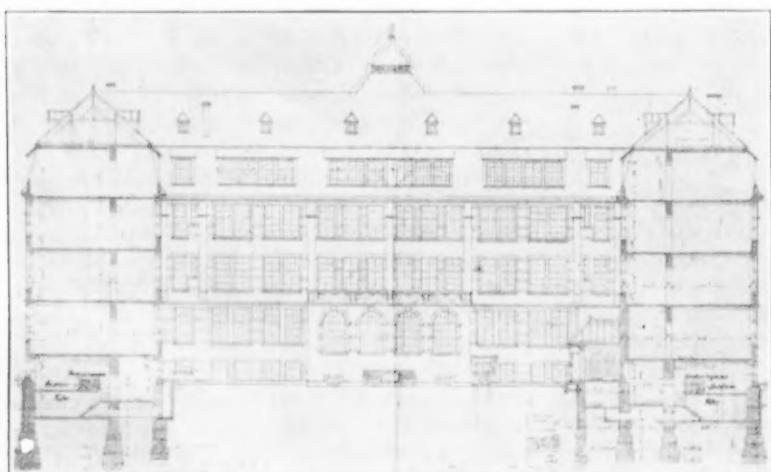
SECTIONAL PLAN OF NEW SCHOOLHOUSE IN MANNHEIM, GERMANY, SHOWING THE PLACING OF AIR WASHER "FILTER" AND OF THE WARM AIR CHAMBER.
